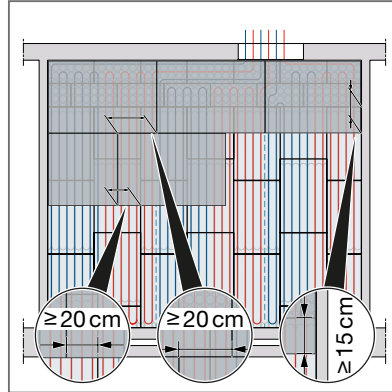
Lay the gypsum fibre construction panels down over the entire surface
